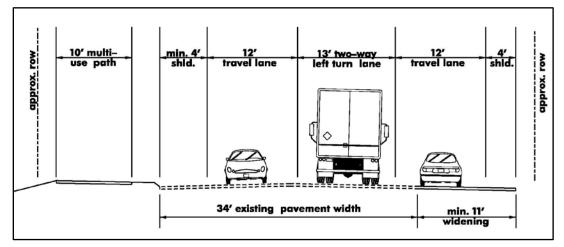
Proposed VT 2A Cross-section Just South of River Cove Road
